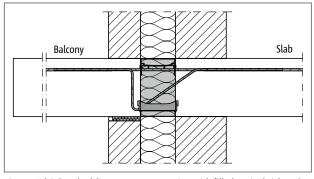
Schöck Isokorb® XT type K: Connection with filled cavity brickwork with core insulation
